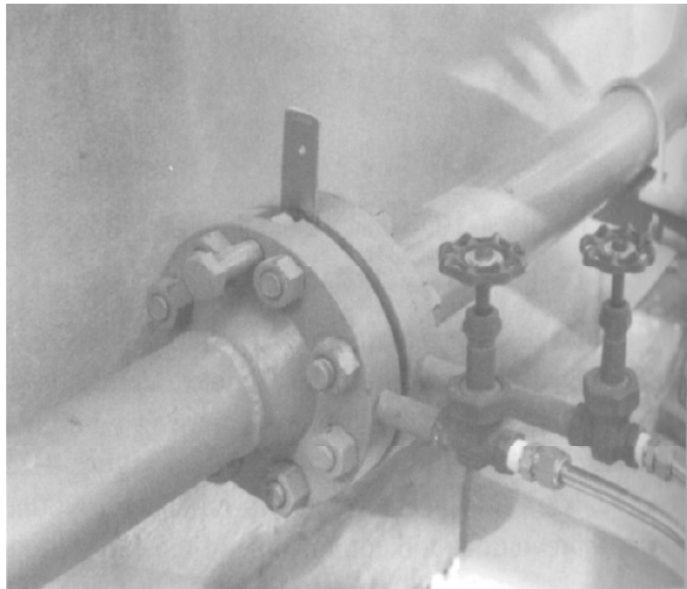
Orifice flange union assembly. *Courtesy of Nisseki Chemical Texas Inc., Bayport, Texas.
